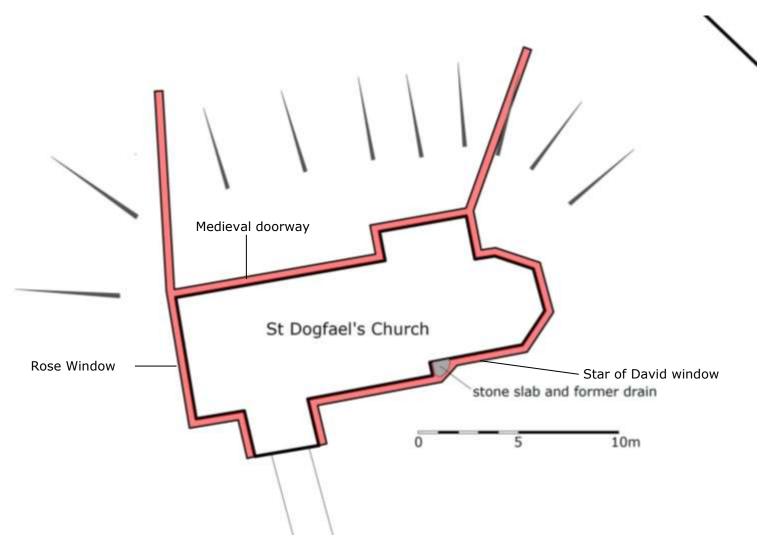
Plan of St Dogfael's Church showing the approximate layout of the replacement drainage and area of watching brief
